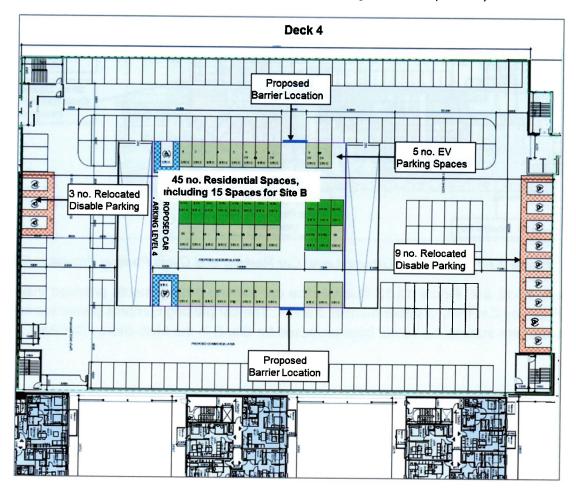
Proposed Multi-Storey Car Park Parking Provision (Deck 4)
